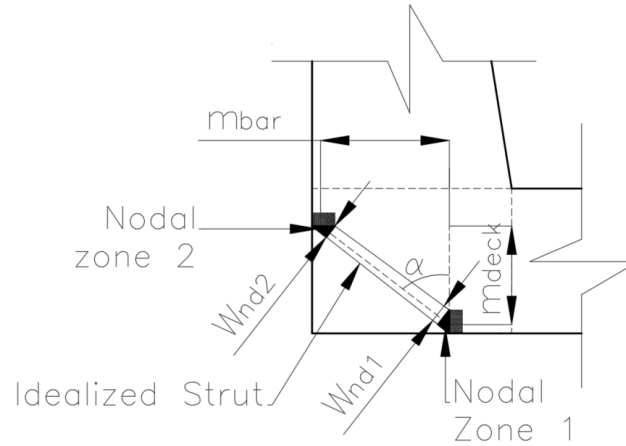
STM implemented into barrier-deck joint with corresponding nodal zones, and compressive strut.
